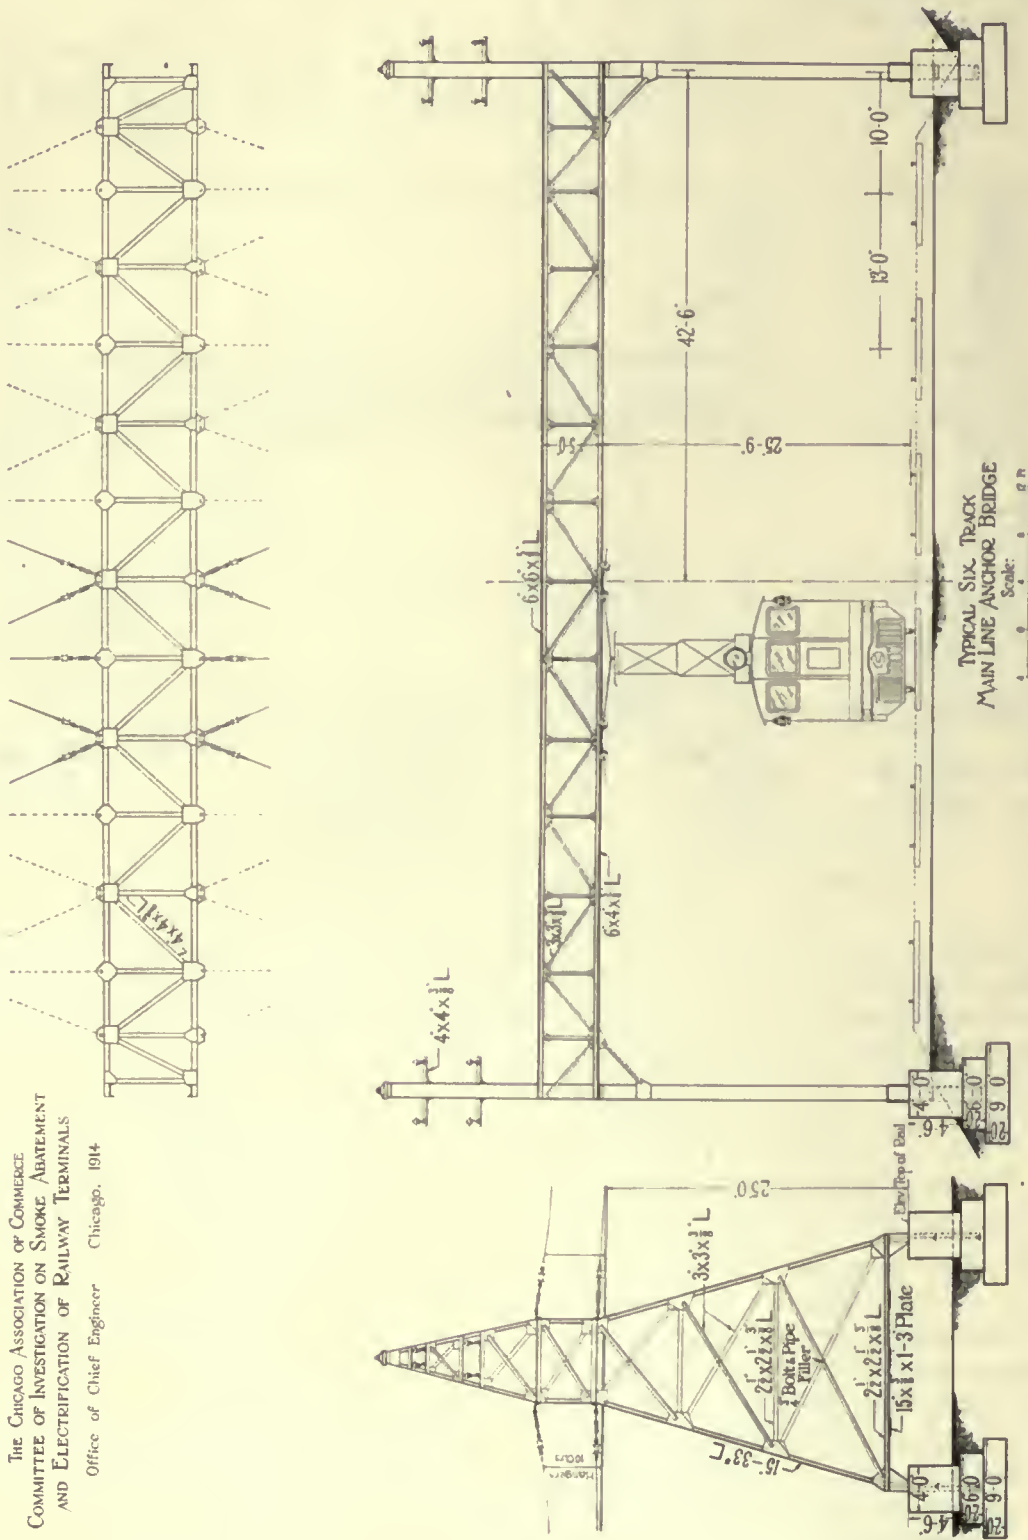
TYPICAL SIX TRACK ANCHOR BRIDGE
